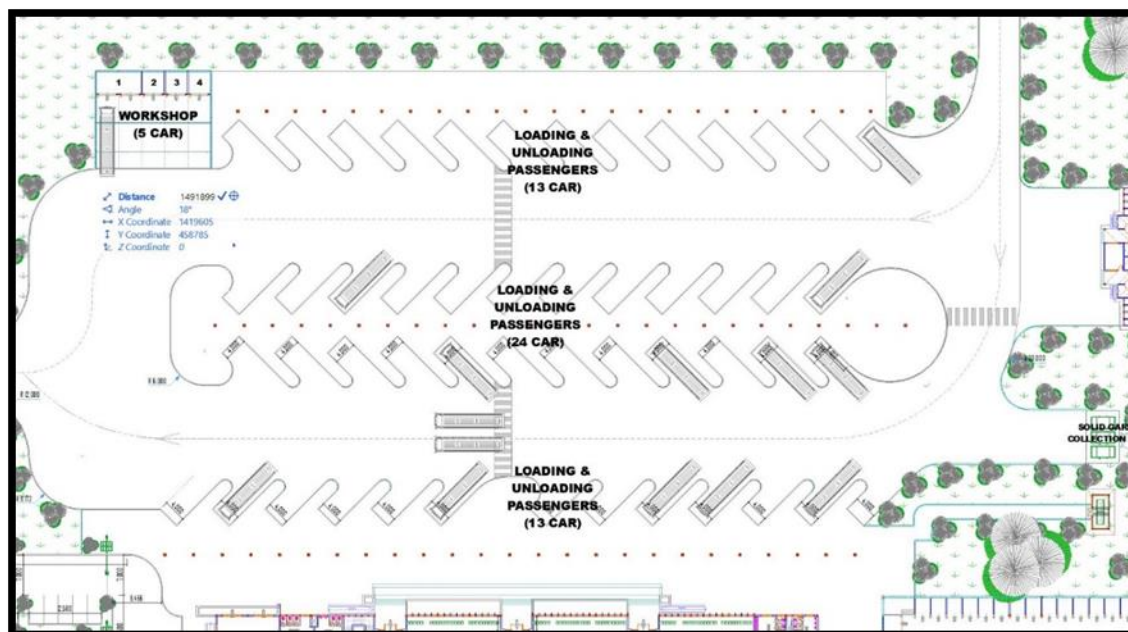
Shows the architectural design for ground floor Plan at the Inala Bus Terminal
